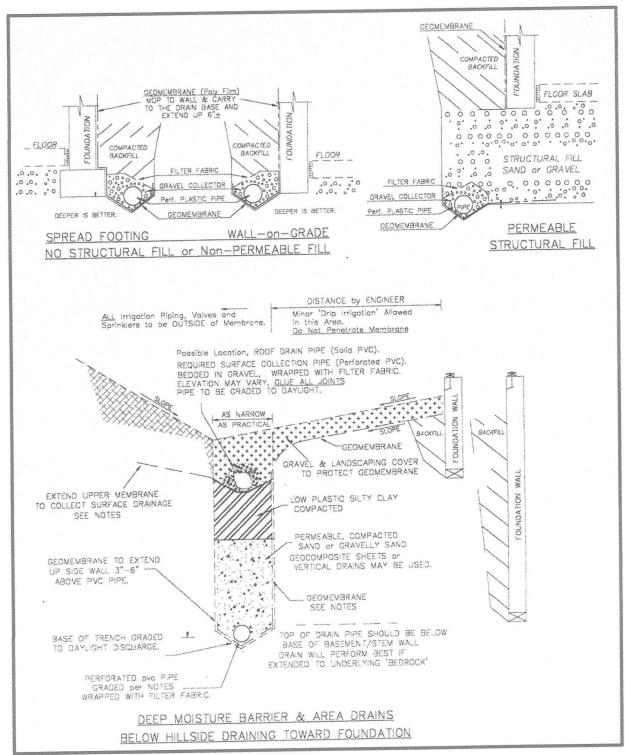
Example Foundation Drains to Carry Water Away from the Foundation.
